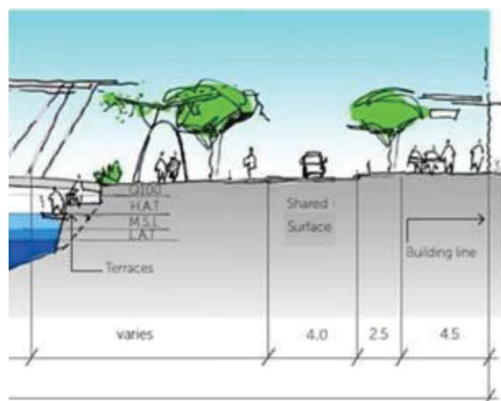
Corso Esplanade (between Main Street Boulevard and Town Centre Boulevard) (Looking East)
